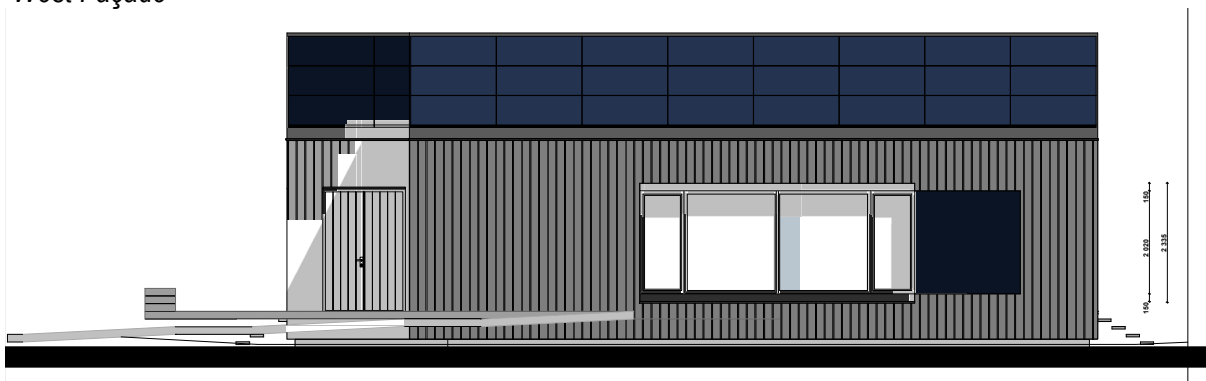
depicts the Living Lab in elevation, whilst Figure 2.4 demonstrates in section, how some of the passive and active strategies work together.
